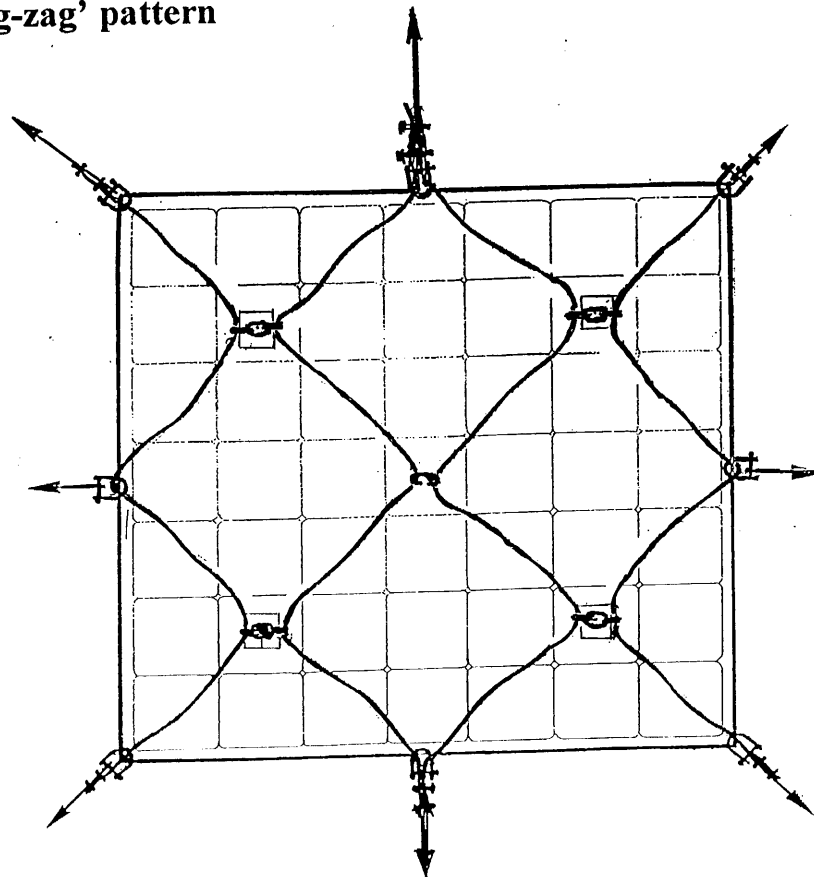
Arrangement of Lacing and Boundary Condition Frame
